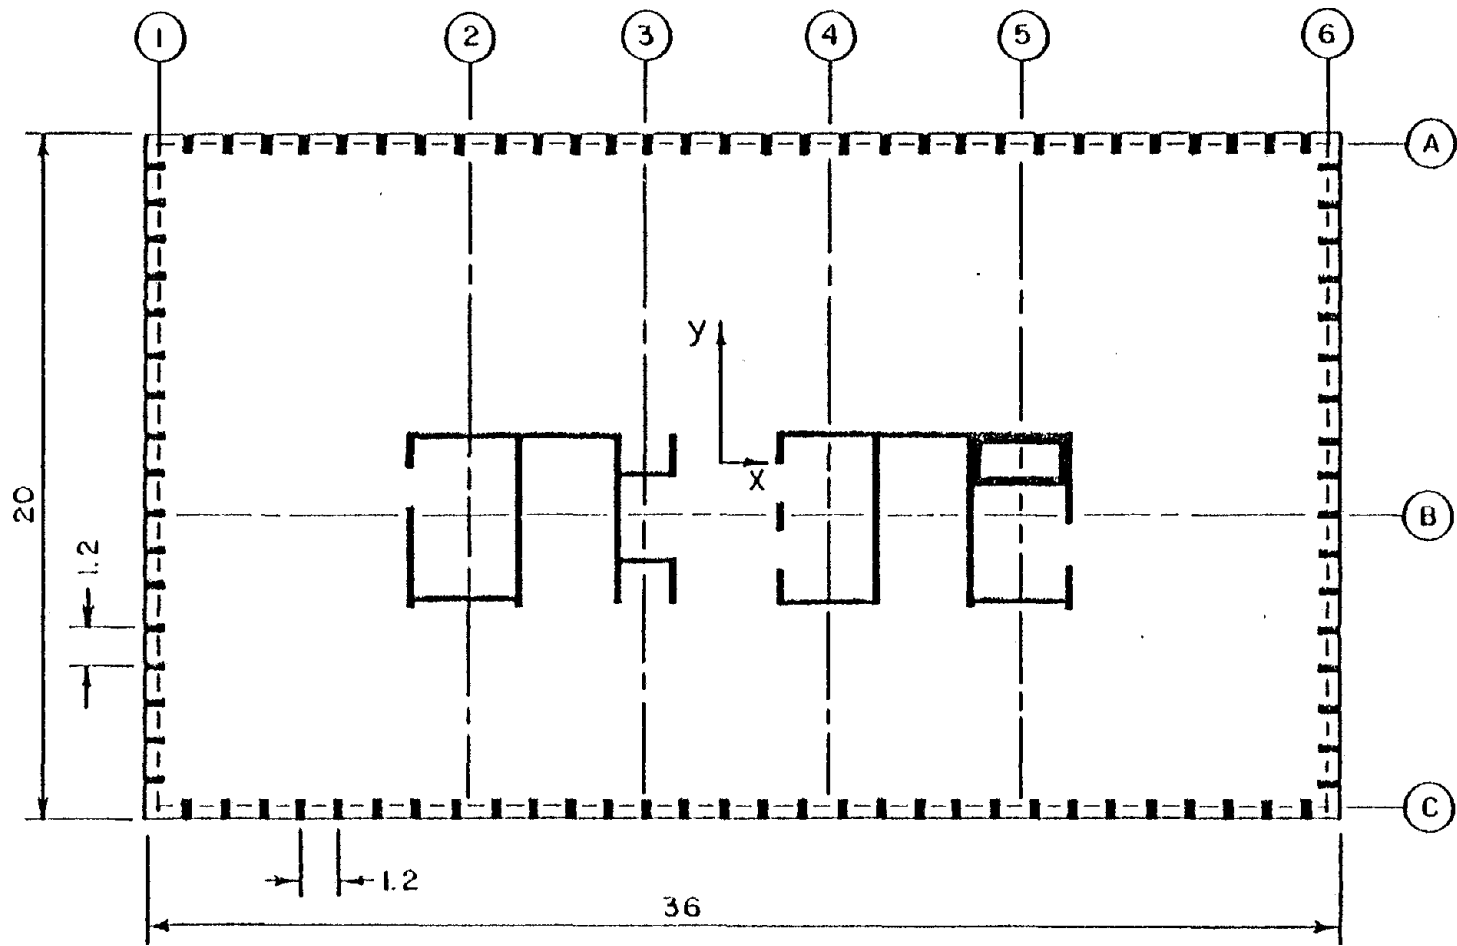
Typical Plan View of the Arts Tower (All Dimensions in Meters).
